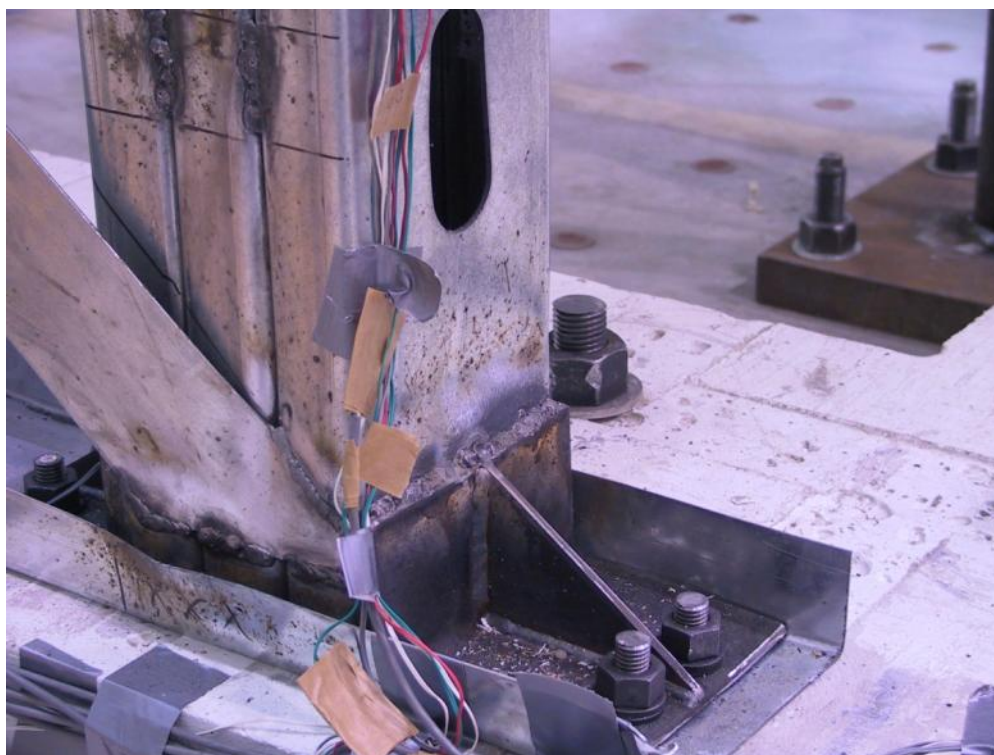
Zoomed in view of the vertical anchor leg and stiffener plate at the bottom of the southwest column, facing northeast.
